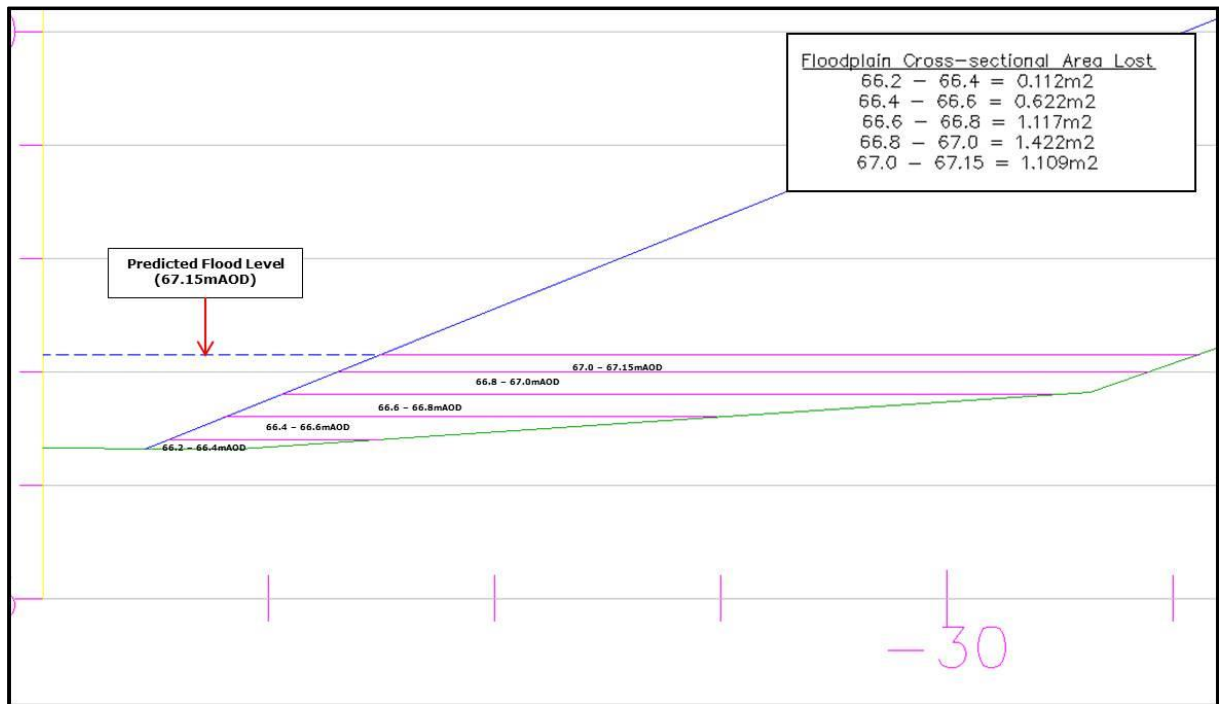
Detailed breakdown of the cross-sectional area of floodplain lost to the embankment widening works at 200mm increments. (Earthwork Section Reference - 2109540)
